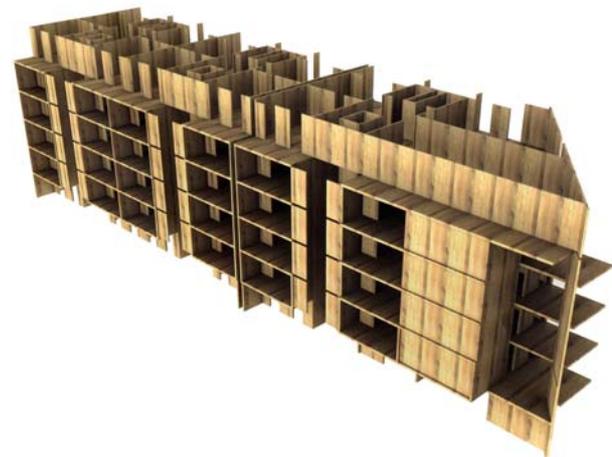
Perspective rendering view of the timber cross-laminated structure of the six storey building
